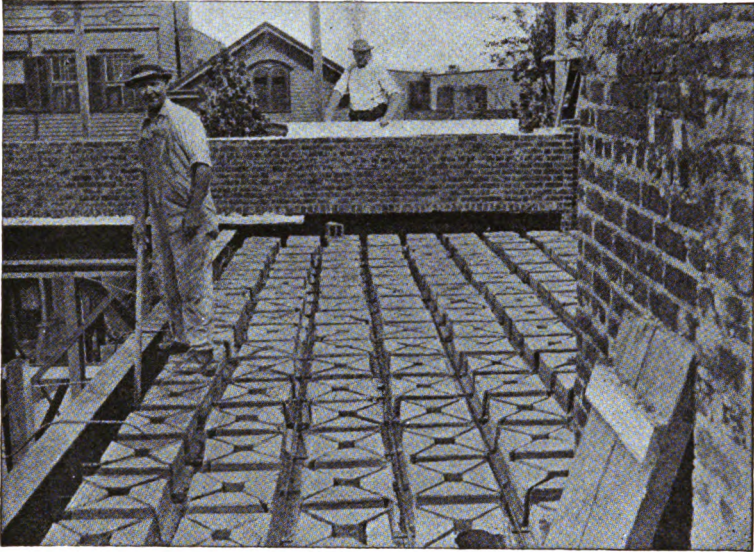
A New Form of Concrete or Clay Blocks—Four Sections Forming a Block
